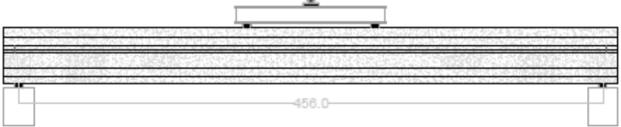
CFRP repair configurations for full-scale AASHTO type II girders statically tested
